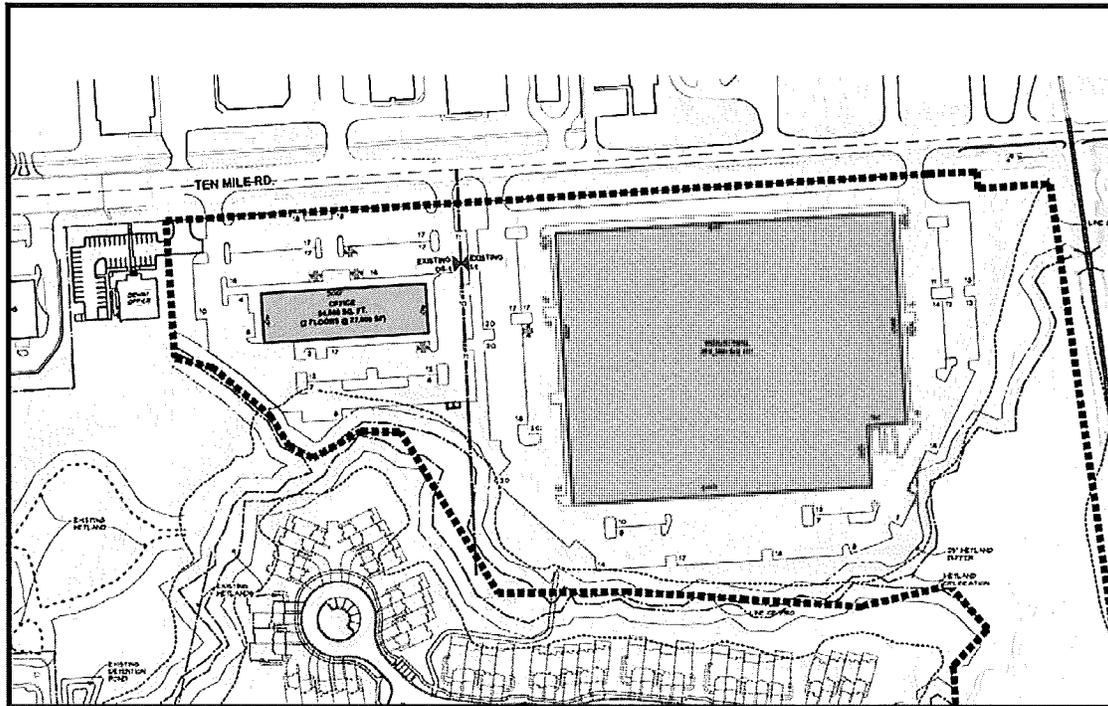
OS-1 and I-1 Parallel Plan
